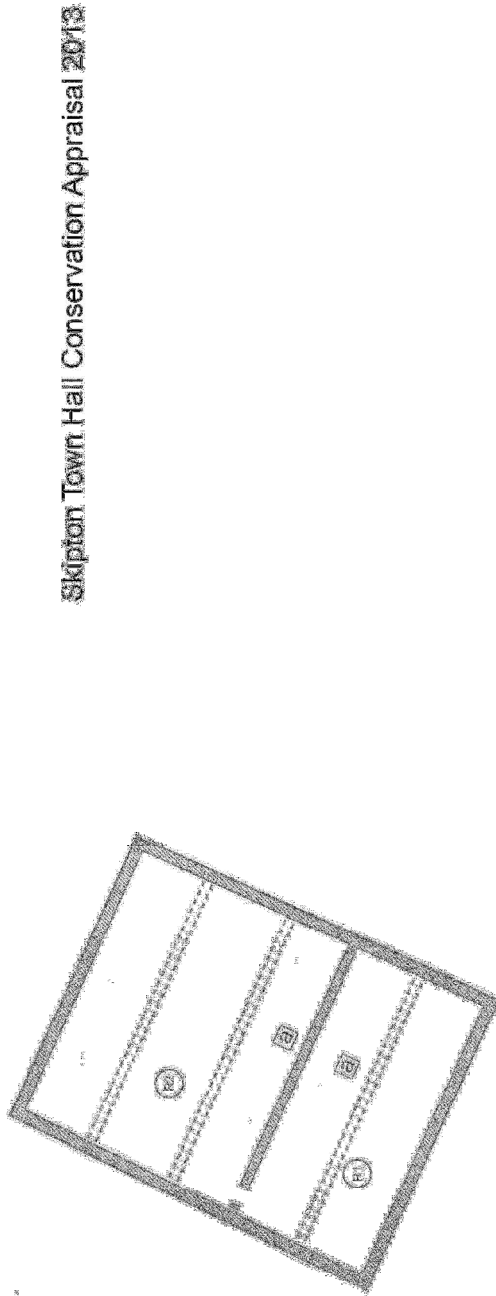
Plan 9: 1830 Big Entry roofspace showing approximate roof truss positions. a = access
